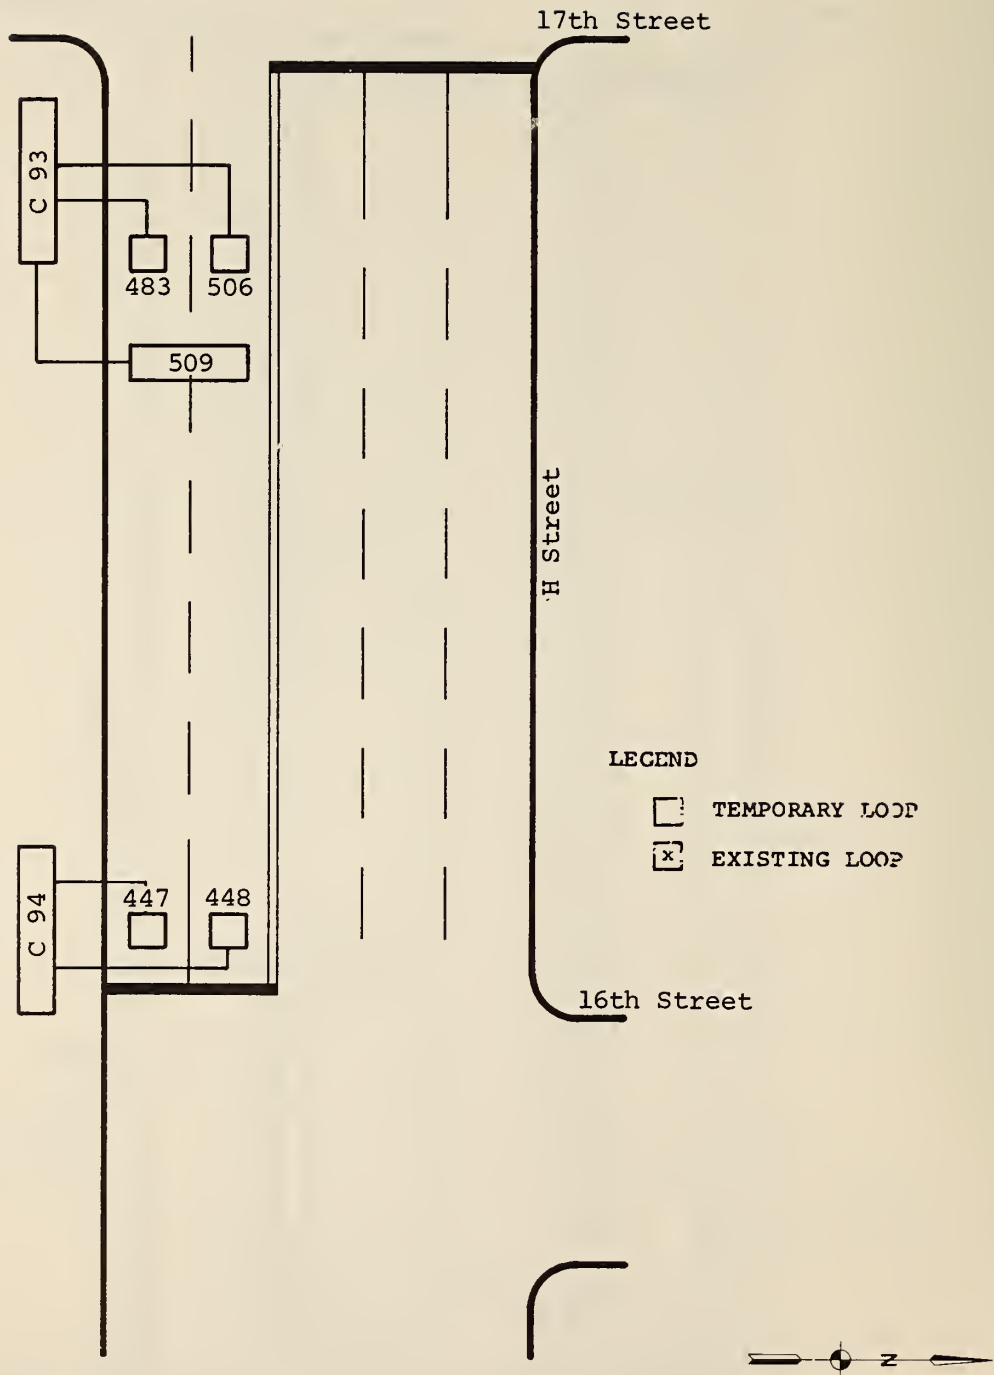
Detector configuration, H Street eastbound between 16th Street and 17th Street.
